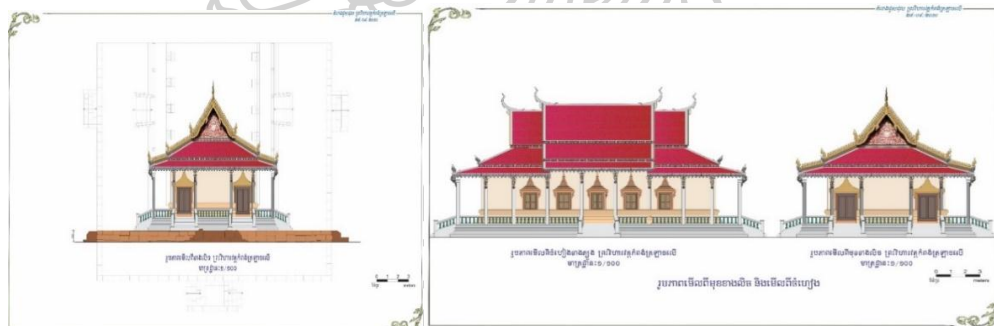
Plan of Vihear Kompong Tralach Leu (outside)
